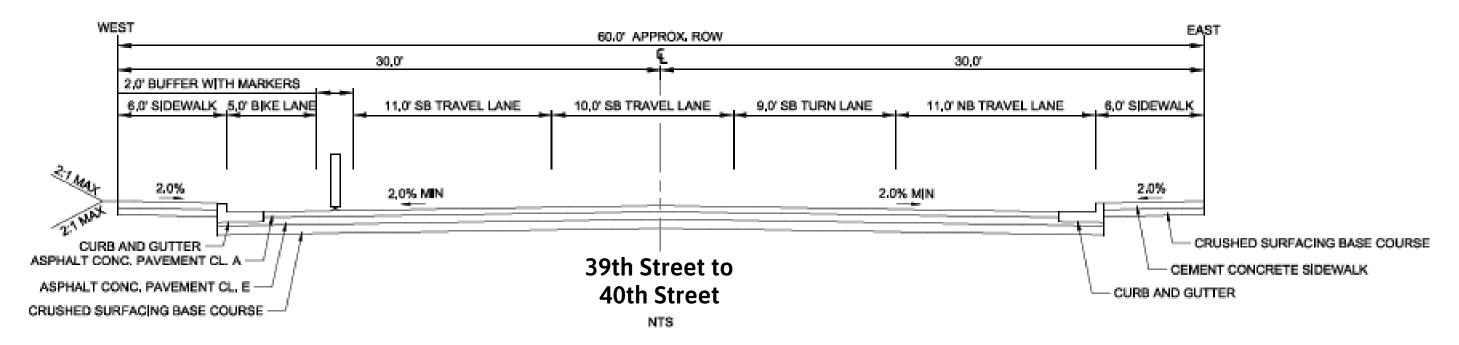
Cross section detail for Main Street between 39th Street and 40th Street
